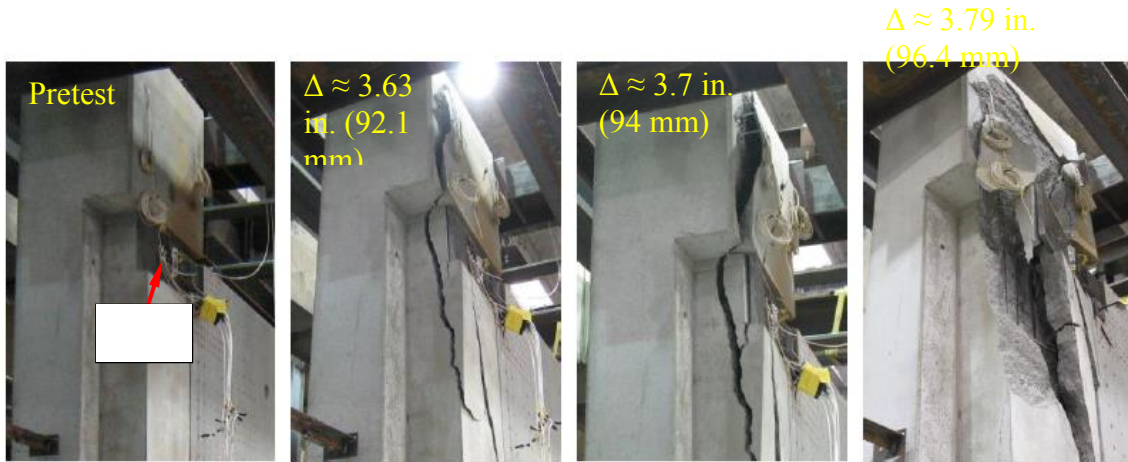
Development of concrete cracks around the upper M8 plate in left (east) end-column; detachment of M8
